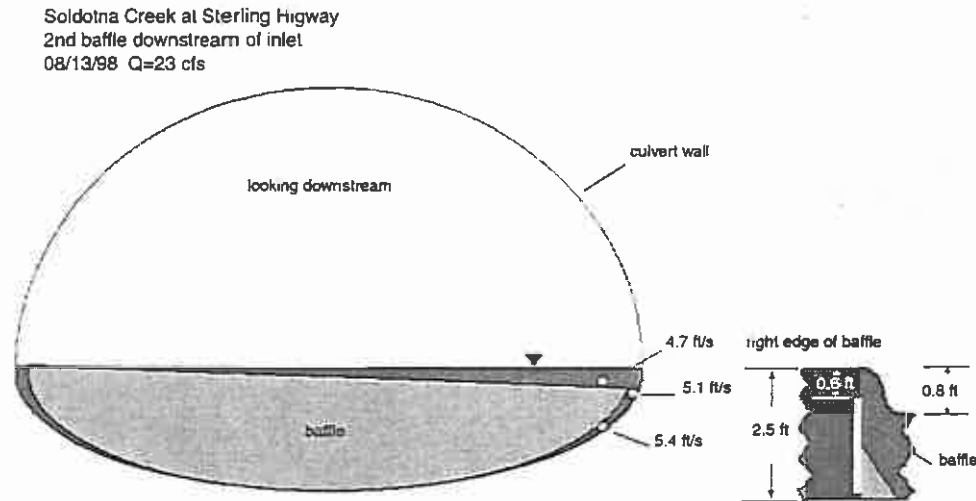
Typical cross-section of baffle showing the upstream water surface, the opening between baffle and culvert wall, and magnitude of water velocities where fish were observed attempting to swim upstream past baffle.
